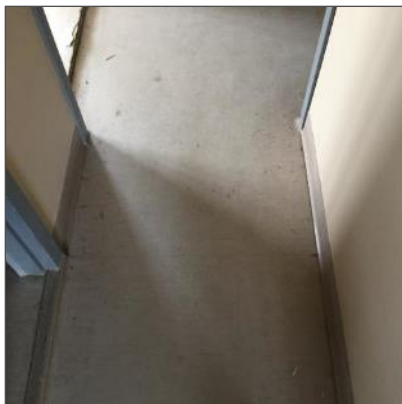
Non-asbestos vinyl sheet flooring with paper backing.
